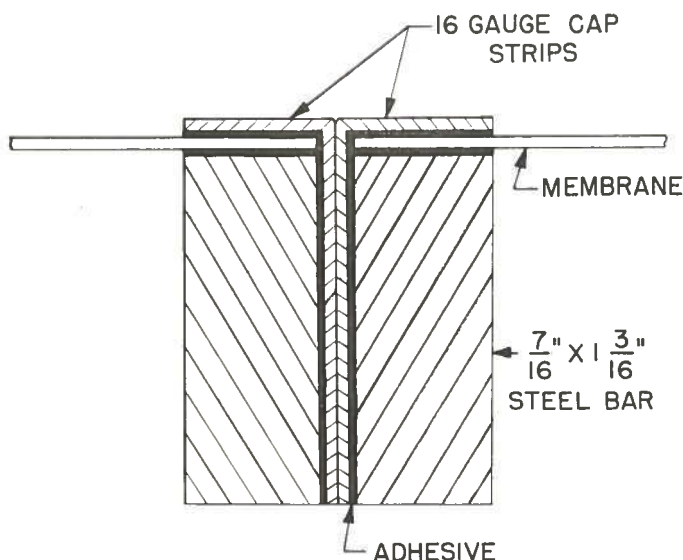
Cross section of joint between two panels of the Lincoln Laboratory metal-space-frame radome
